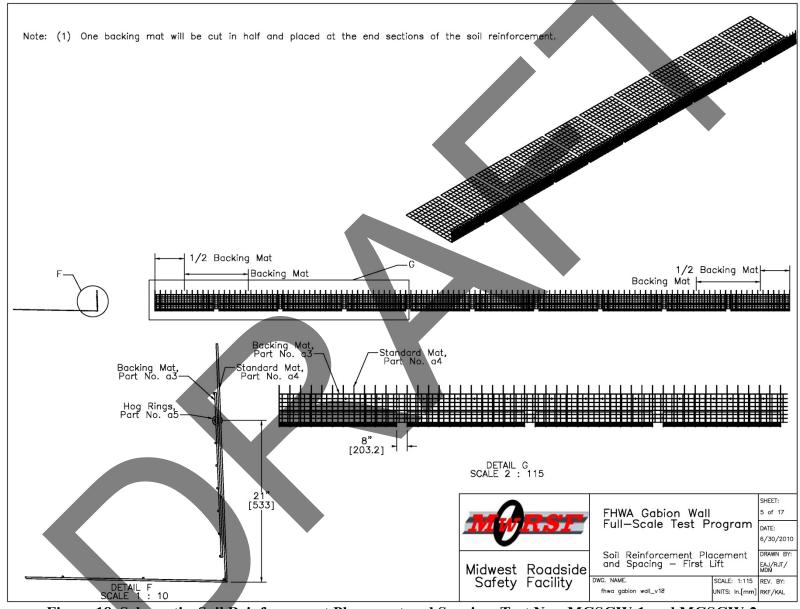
Schematic. Soil Reinforcement Placement and Spacing, Test Nos. MGSGW-1 and MGSGW-2.
